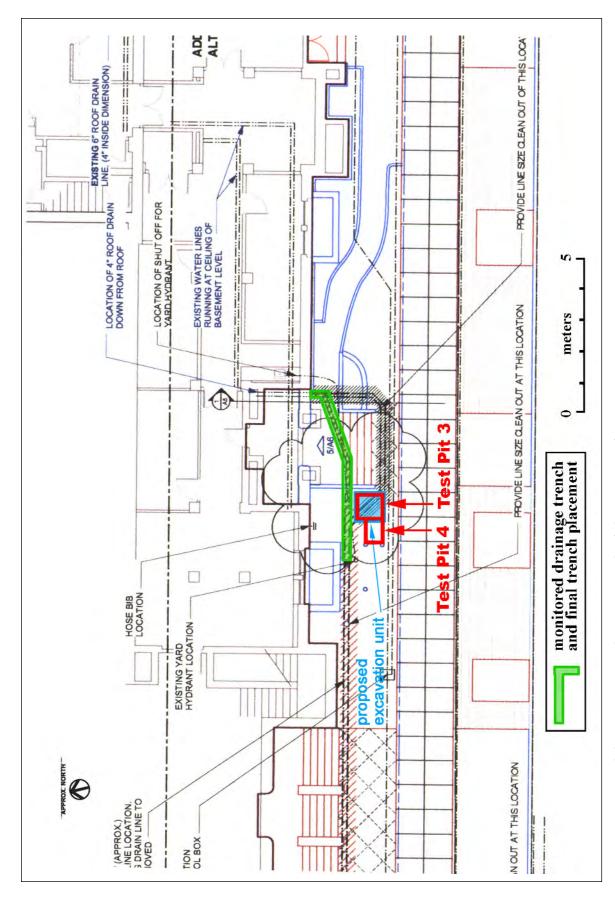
Proposed drainage pipe replacement south of the Museum of Fine Arts.
